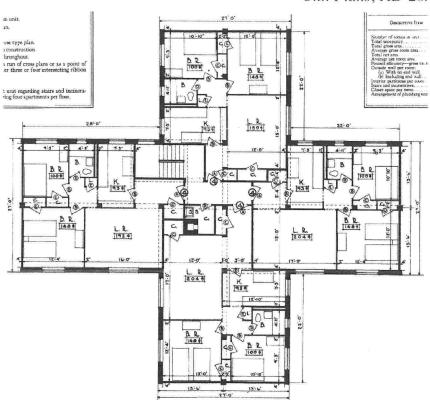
Cross plan. *Unit Plans*, HD-35.
